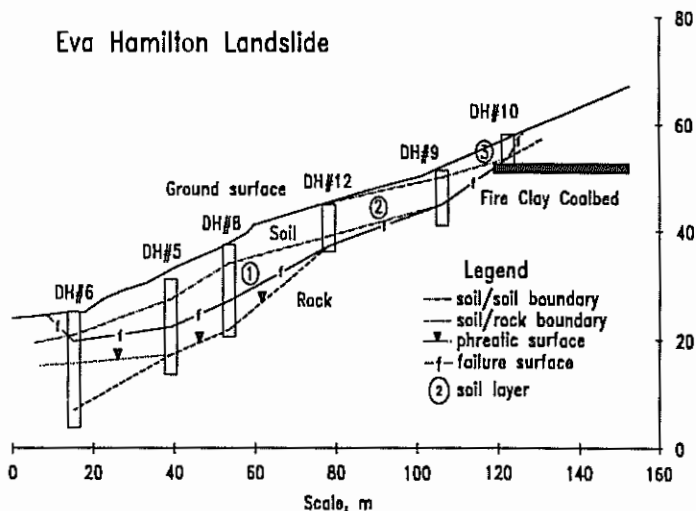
Cross-section of a typical eastern Kentucky AML landslide where underground mine has emitted water in the natural soil slope.
